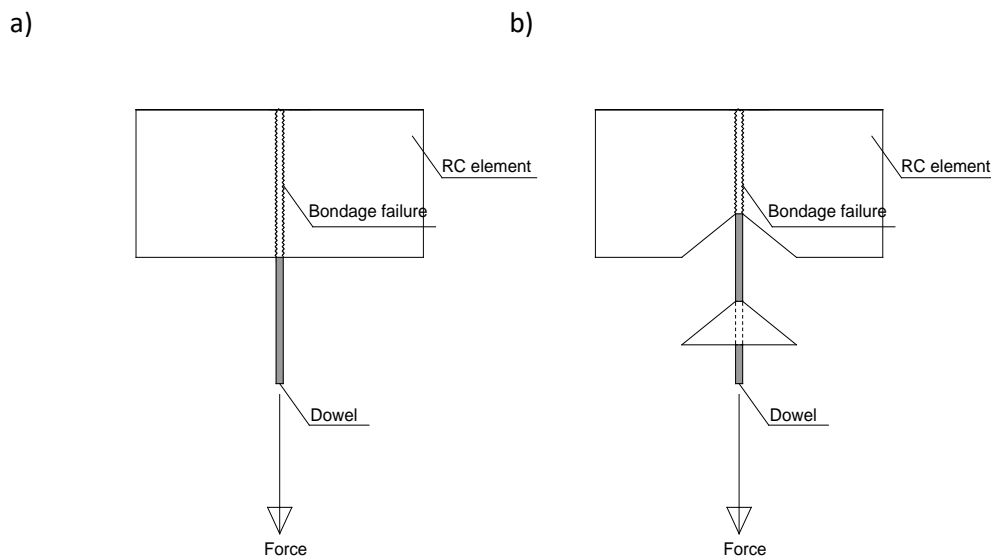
Possible dowel pullout failure in the case of a short anchorage height
